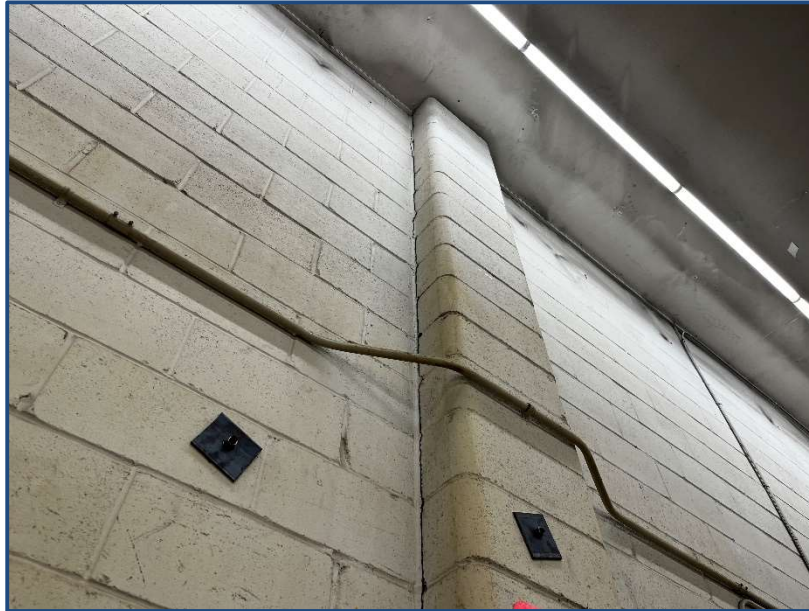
Cracking in Block Wall between Garage No. 1 and No. 2
